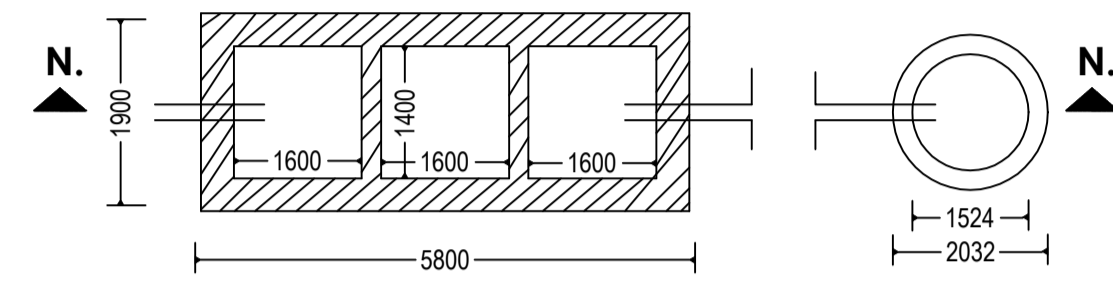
DETAIL OF GROUND WATER RECHARGING PIT WITH SLIT TANK
